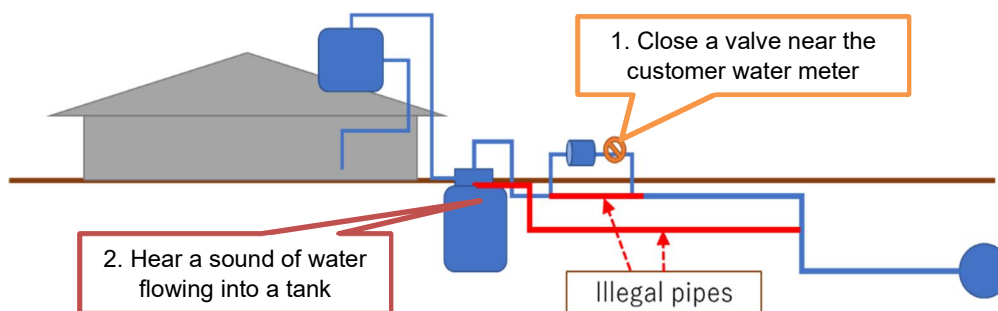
How to Find Illegal Pipe toward Underground Tank
